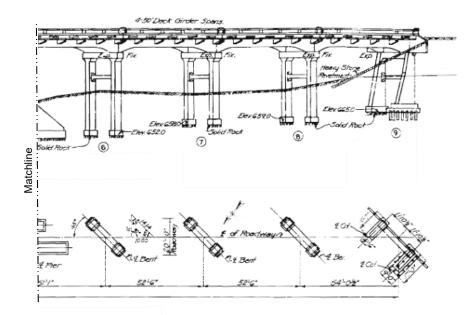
Spring Valley Bridge (J0420) Typical Section through Approach Spans
